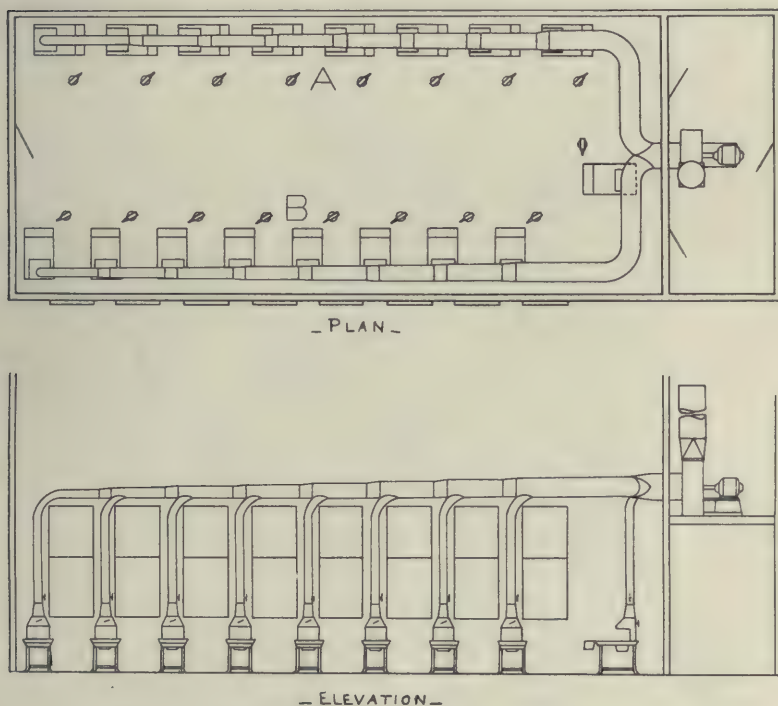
DIAGRAM SHOWING FLOOR-PLAN AND ELEVATION.
